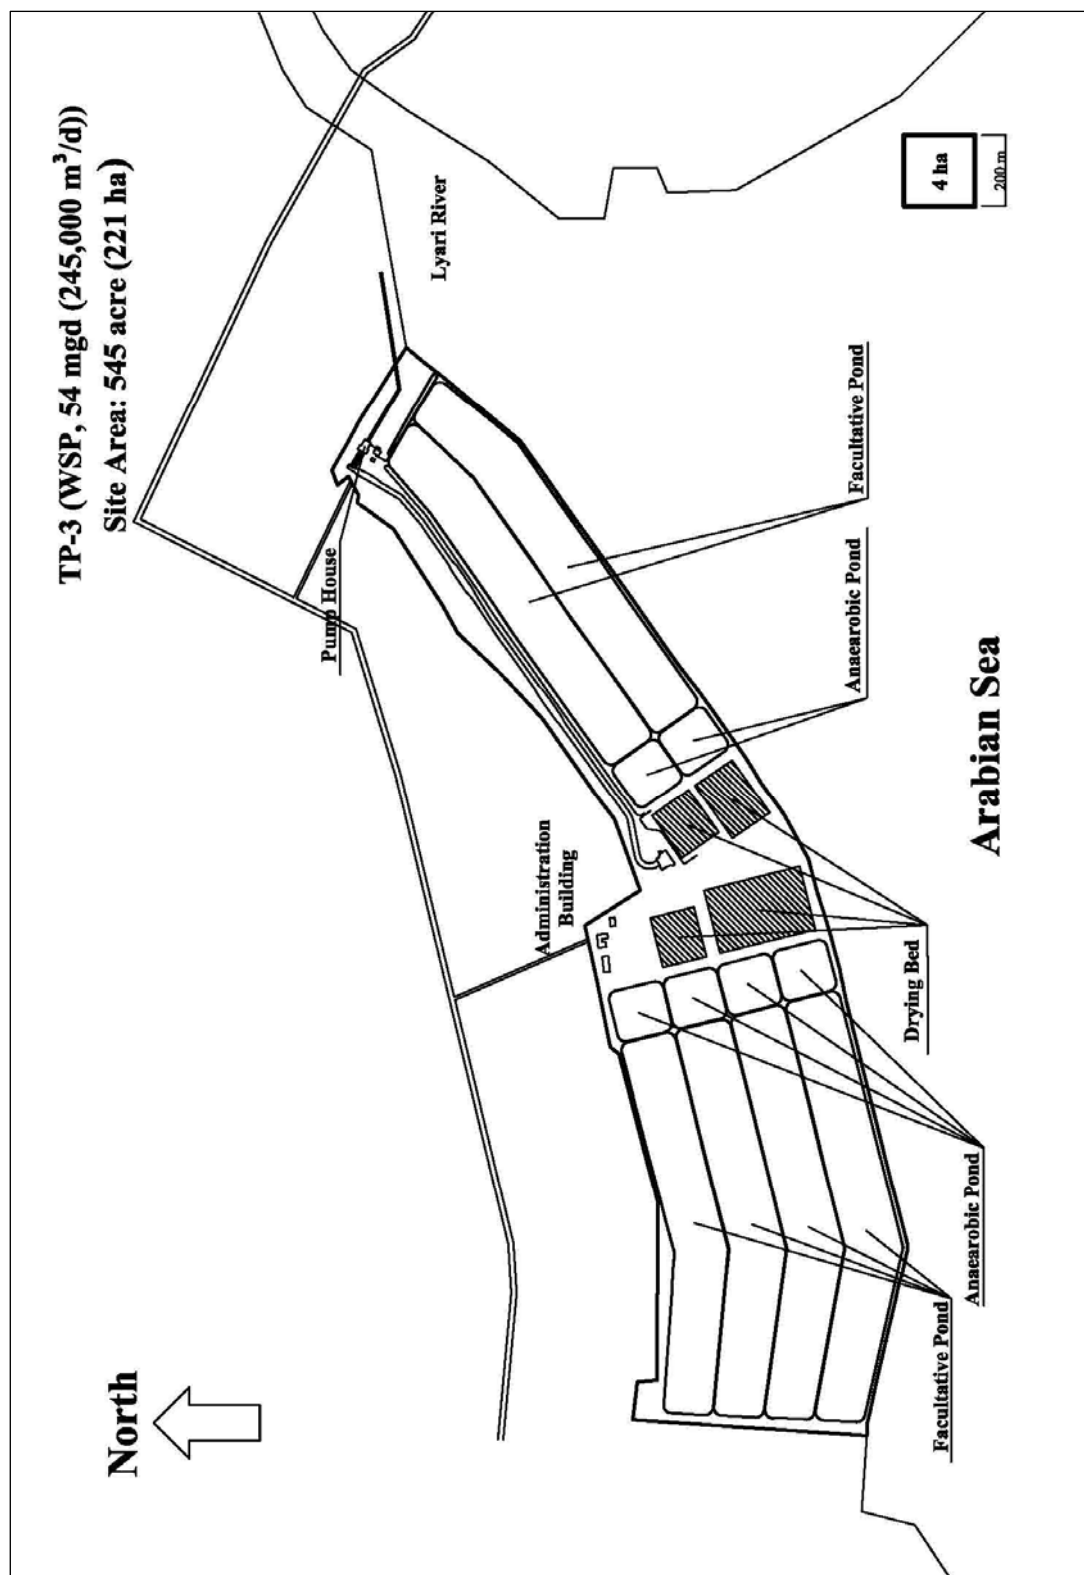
General Plan of Sewage Treatment Plant TP-3
